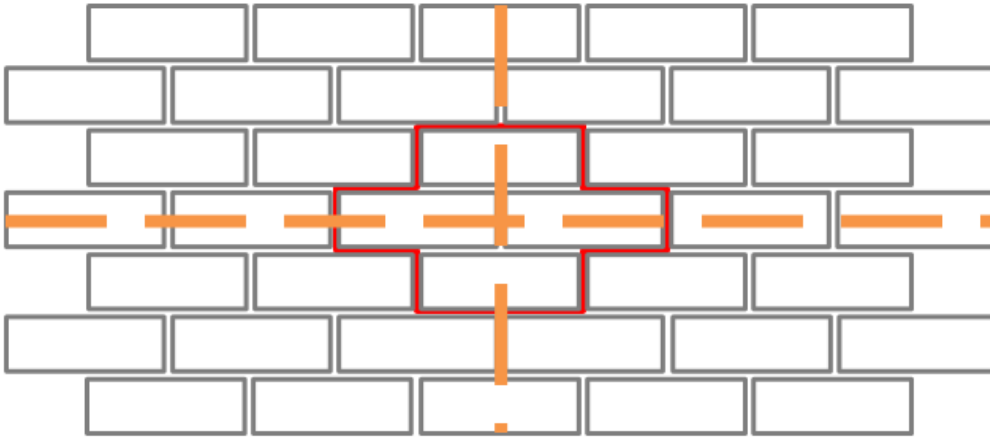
Extent of the brickwork / masonry removed on line of compartment or separating walls and floors
